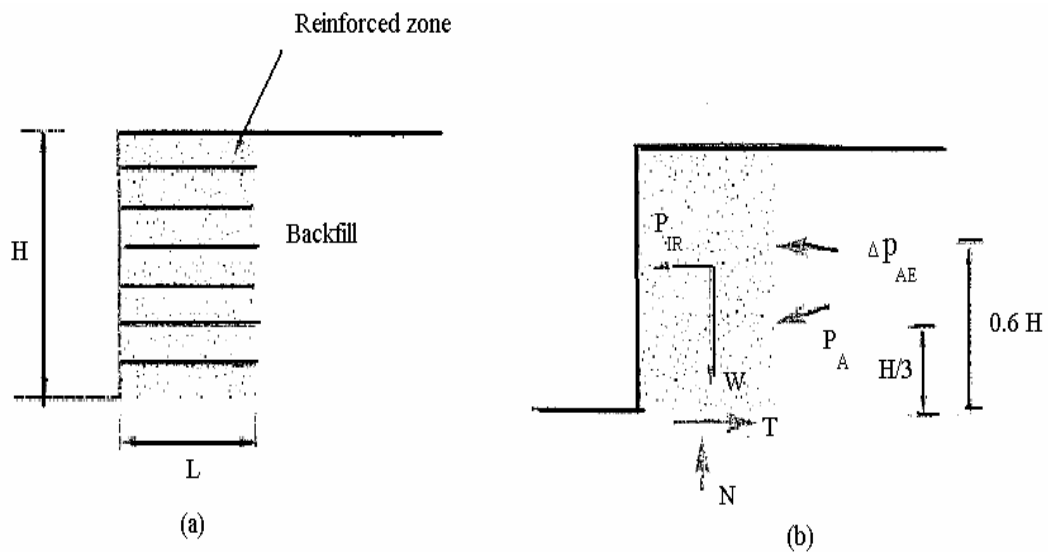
(a) Geometry and rotation for reinforced earth wall - (b) Static and pseudo-static forces applied to reinforced zone (Kramer, 2003)
